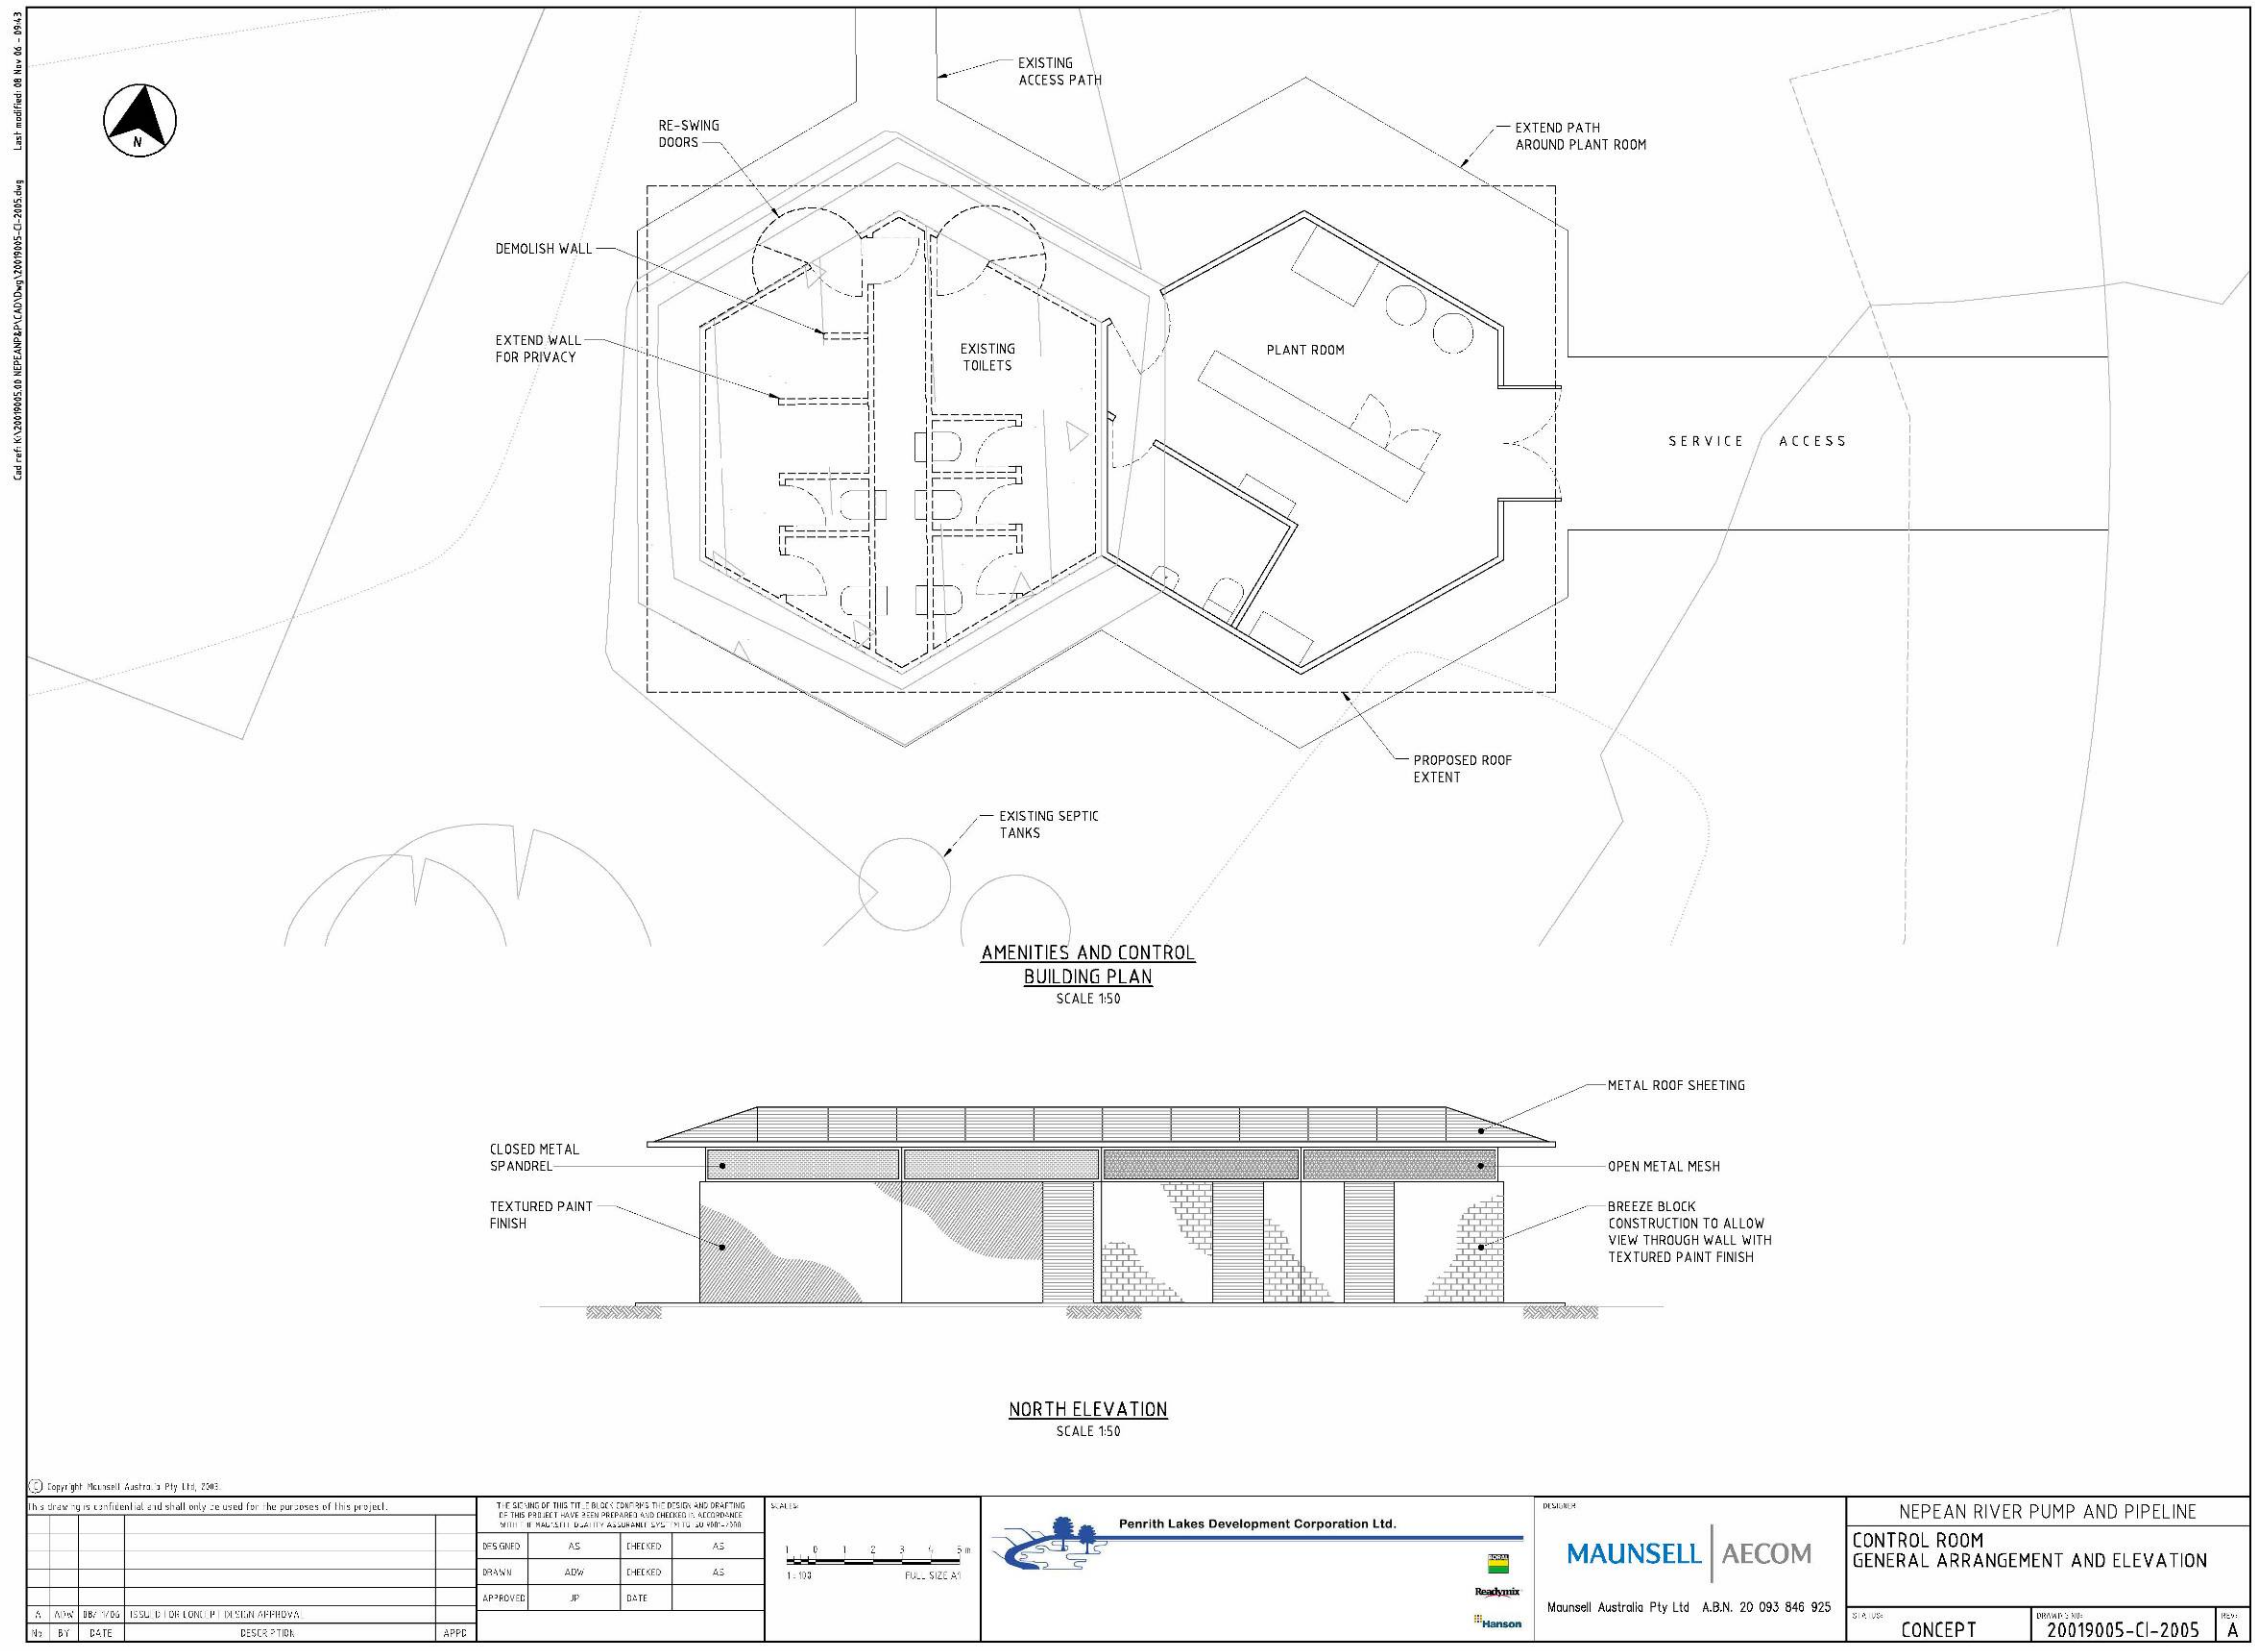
Proposed Control room twin hexagon co-located with existing toilet block.
